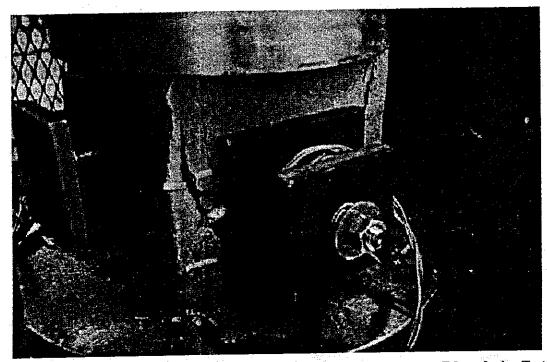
Picture Showing Early Stages of Concrete Spalling Occurring at Edges during Test
